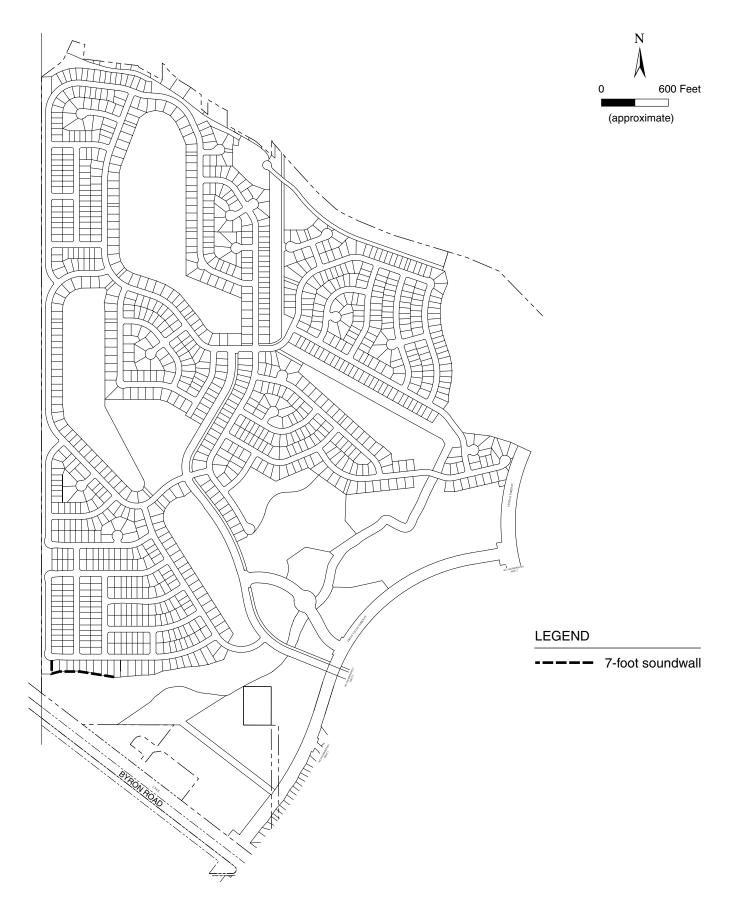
SOUNDWALL PLAN FOR NEIGHBORHOOD I
